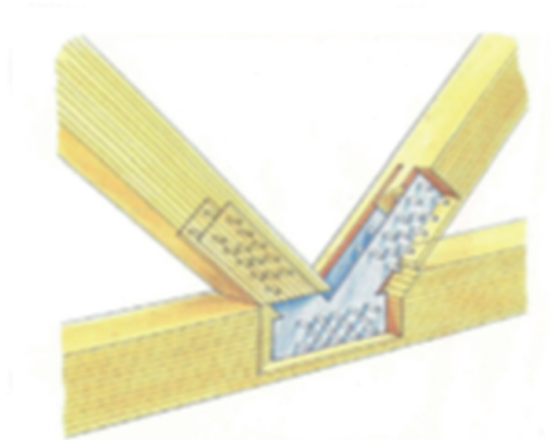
Details of slotted-in steel plates connecting all structural beams and columns in the “Treet” building structure [12]
